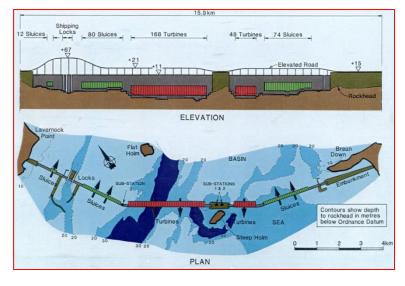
Cardiff to Weston Elevation and Plan imagery from STPG.
